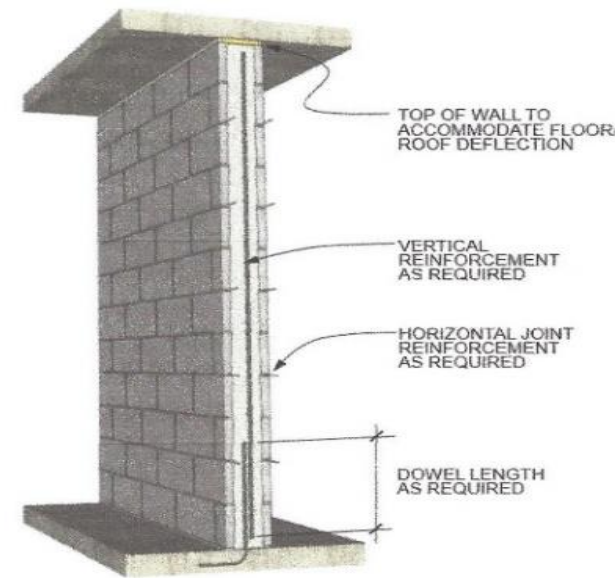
Cantilevered Wall Detail from IMI Masonry Detail Series, <http://imiweb.org/masonry-detailing-series/>
